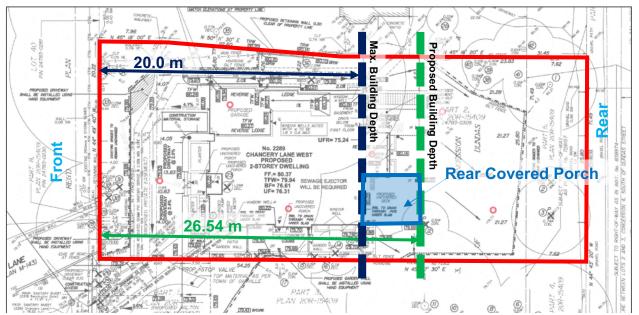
Proposed Covered Rear Porch, Max. Permitted Dwelling Depth, Proposed Dwelling Depth
